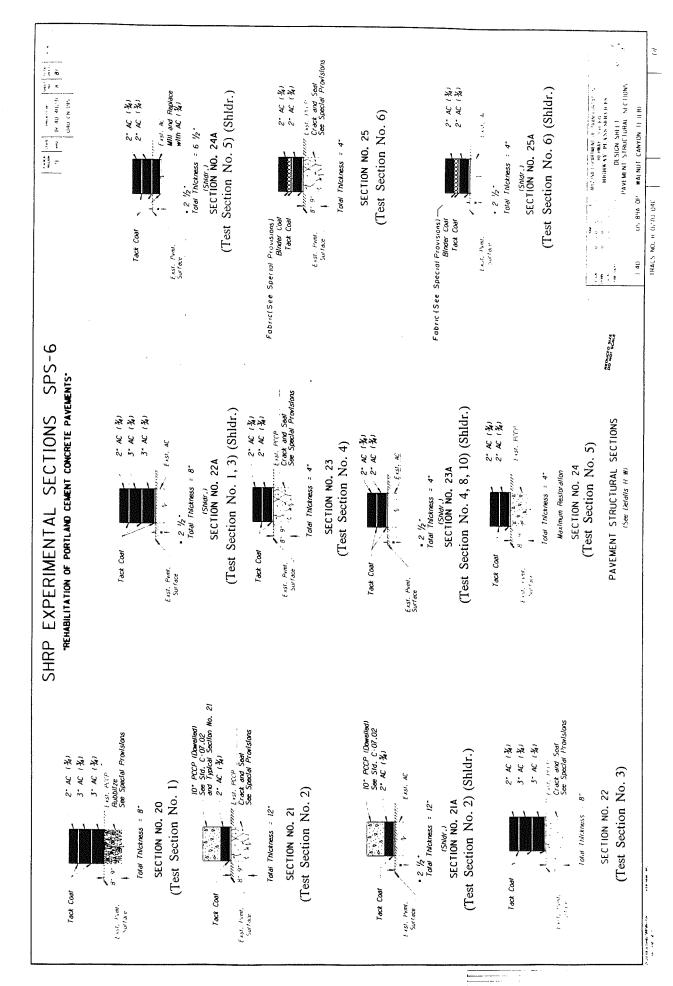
PAVEMENT STRUCTURAL SECTIONS
